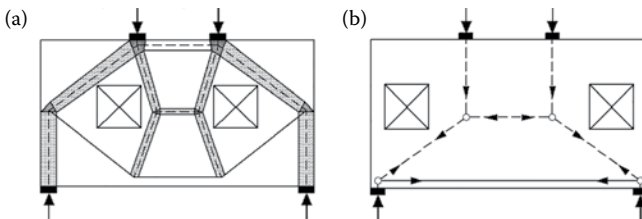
Examples where the *STM* should go around the openings in deep beams.
